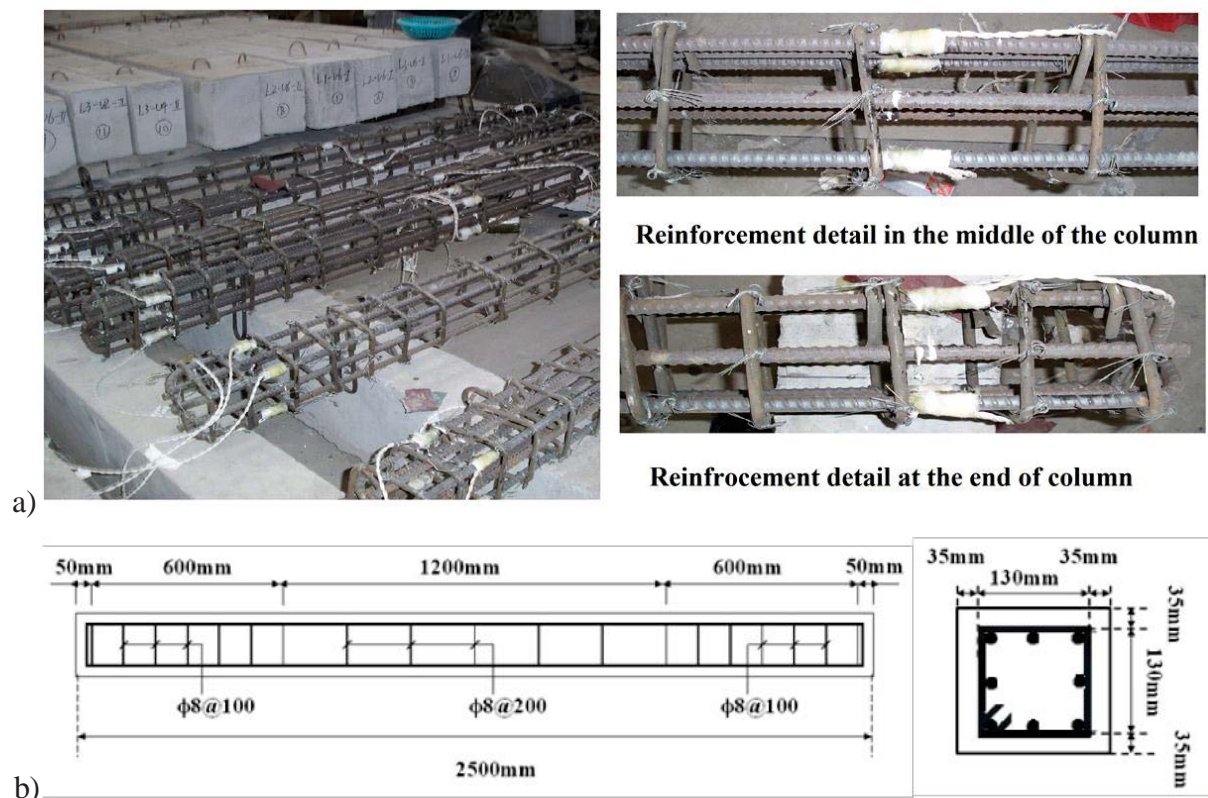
a) Reinforcement, and b) dimension and reinforcement arrangement of UHPC and HSRC columns
